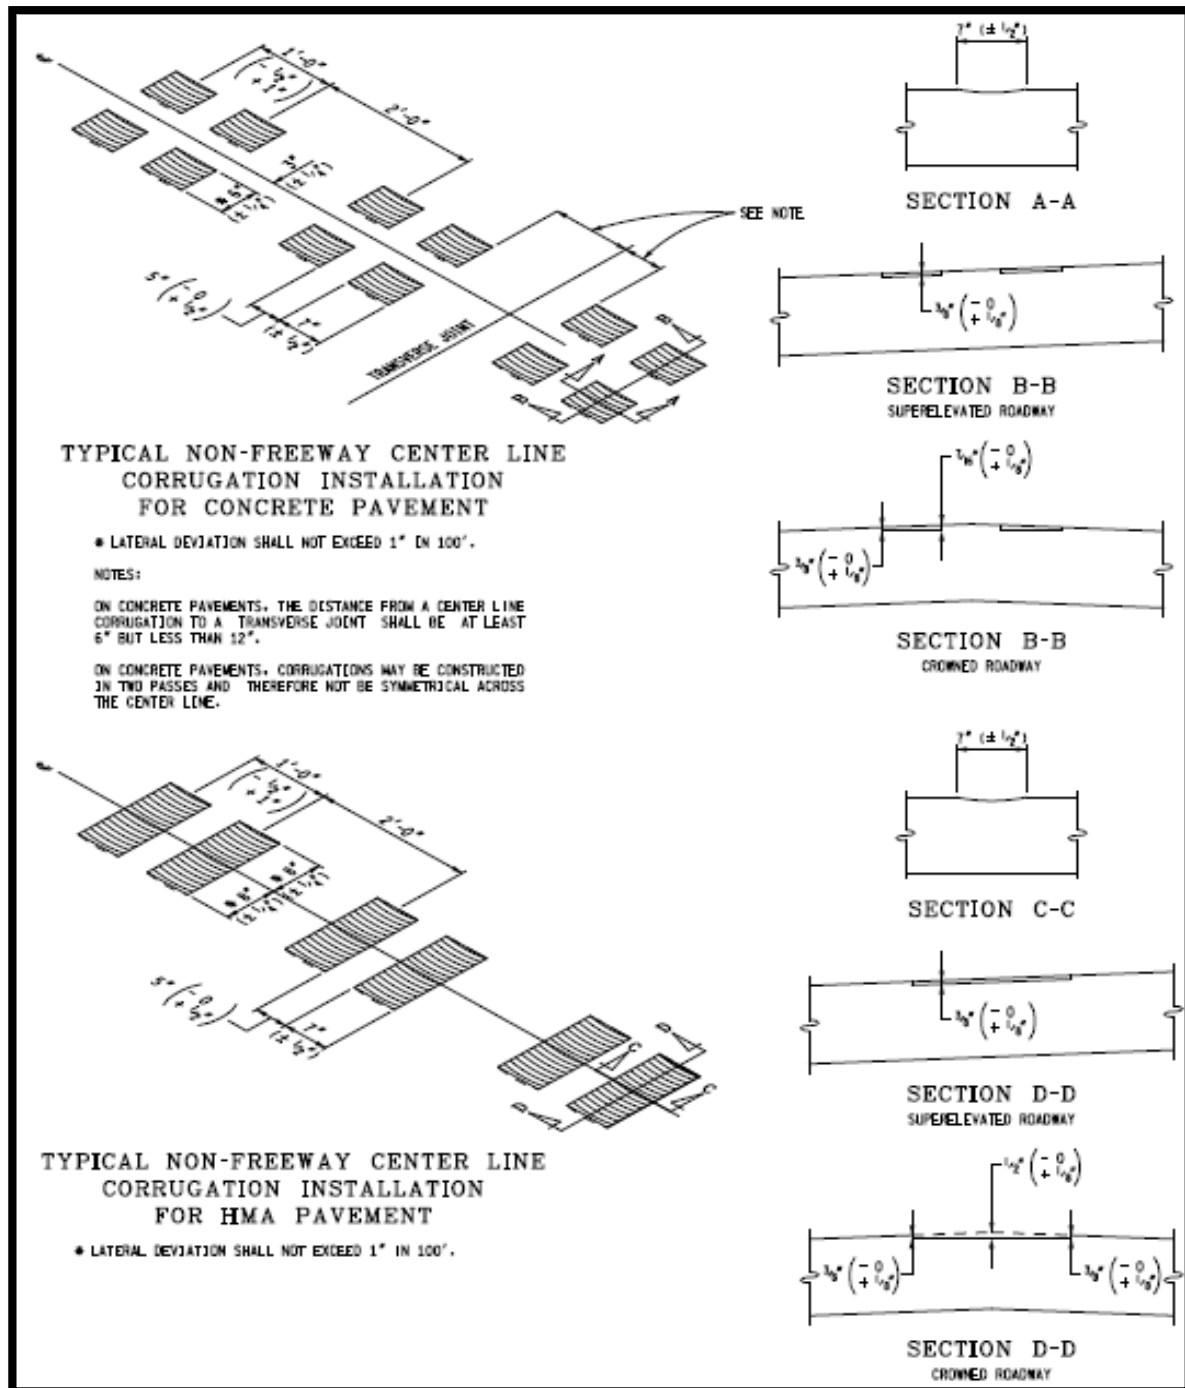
MDOT Non-Freeway Centerline Rumble Strip Dimensions (6)
